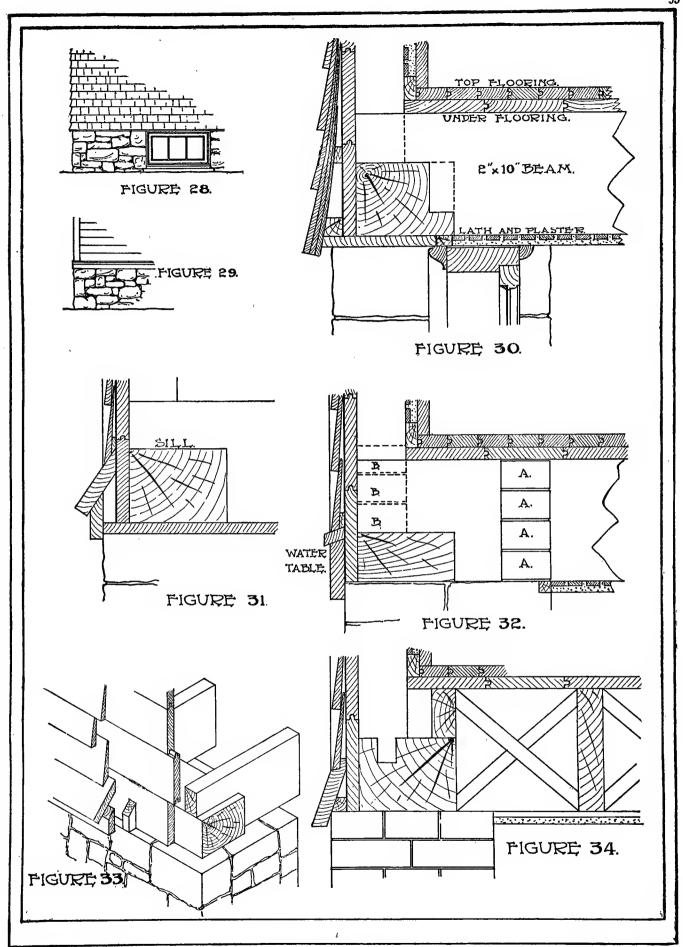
SILL CONSTRUCTION FOR FRAME HOUSES
